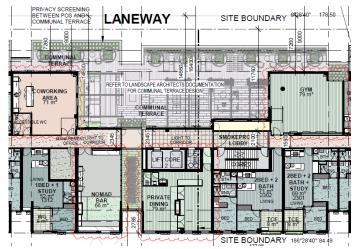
Communal spaces in PLN16/0922 – 1-57 Wellington Street & 71-77 Victoria Parade, Collingwood
